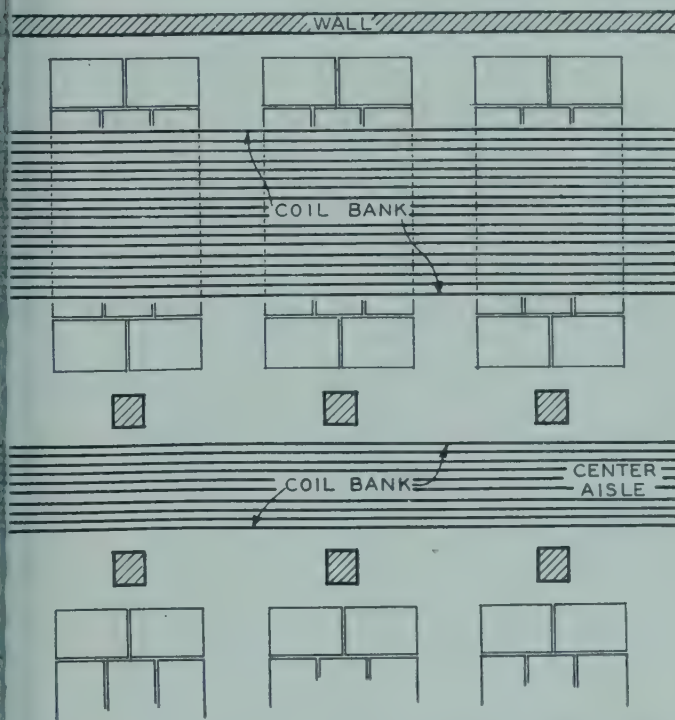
Plan of Part of Cold Storage Room. A Typical Layout for Storing Frozen Foods, Locating Wall and Column Racks and Floor Dunnage to Separate Products from Contact with Sources of Refrigeration Losses.
